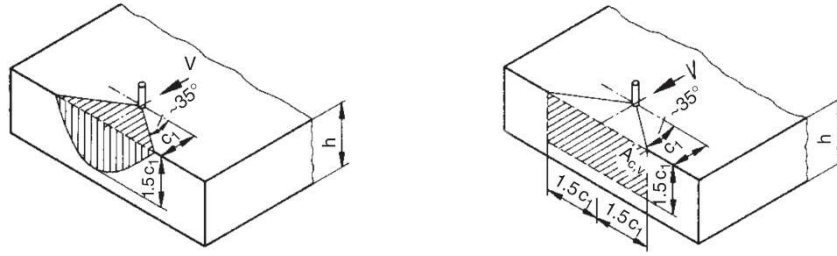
CC method adapted for anchors loaded in shear [1]
